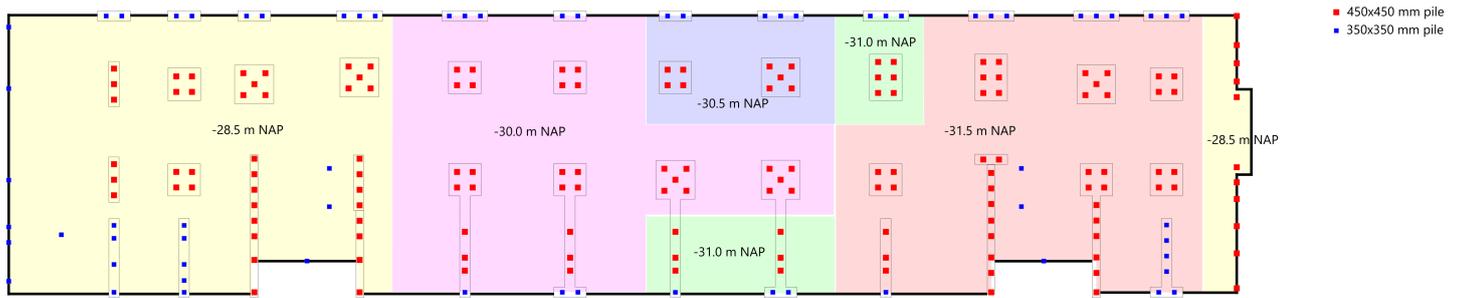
Pile Plan - KasseNova aan de Vaart - Current Design
